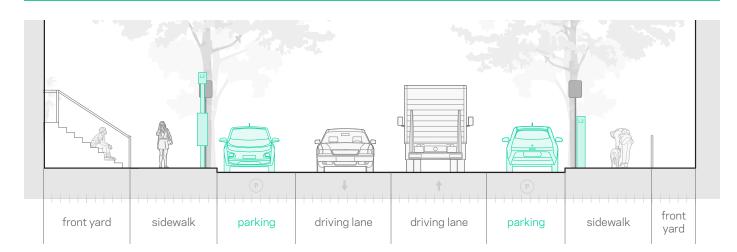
Typical two-way Local Street street section depicting right-side charging station installations. Local Streets can also be one-way.
